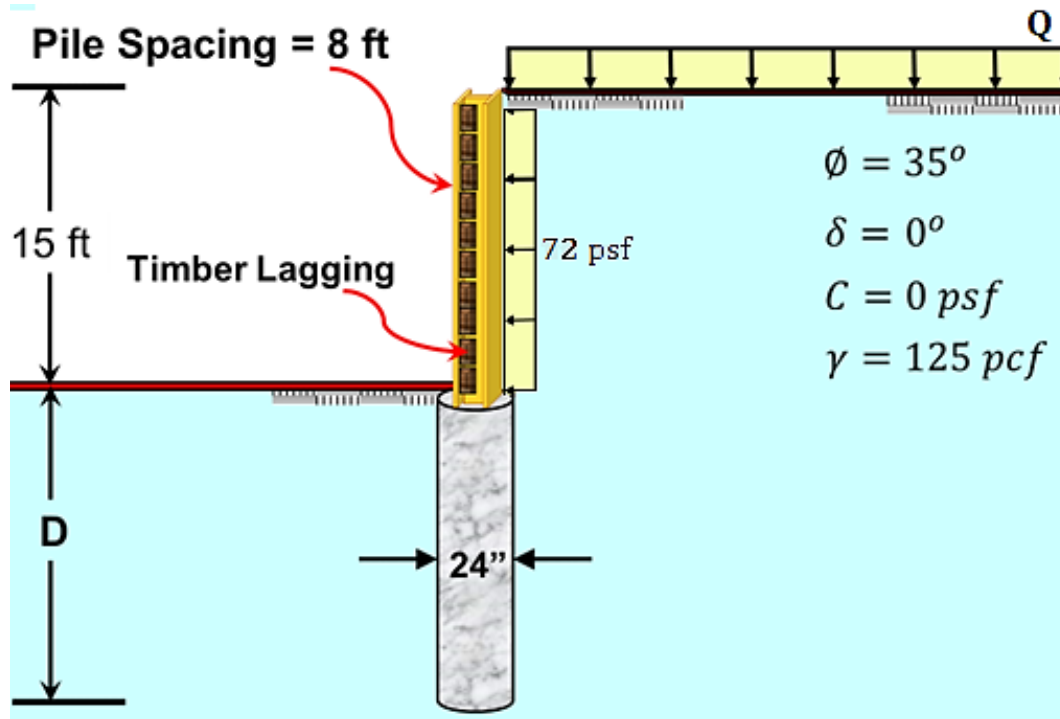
Cantilevered Soldier-Pile-Lagging Wall Example Properties
